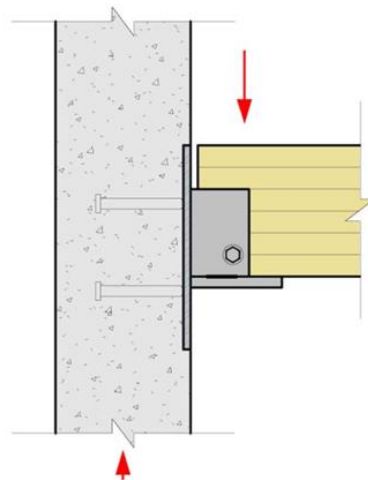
Connection glulam beam to concrete wall with steel plate [82]
